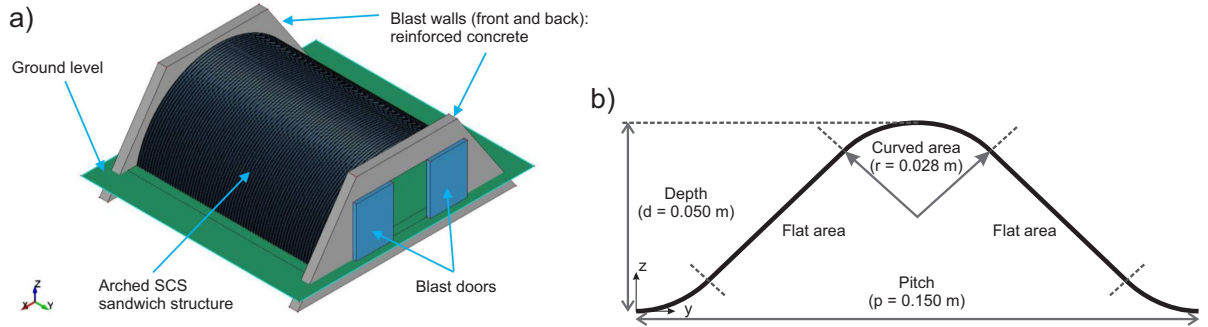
a) Schematic view of the protective structure; b) Profile of corrugated steel plate
